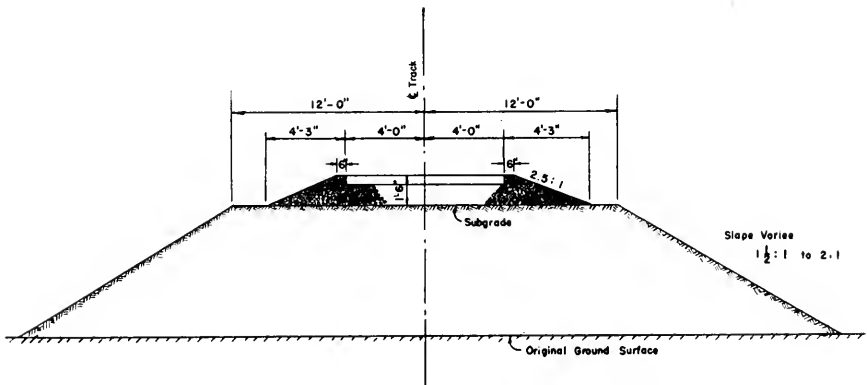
Typical embankment section, KO&G Fort Gibson Reservoir relocation.
